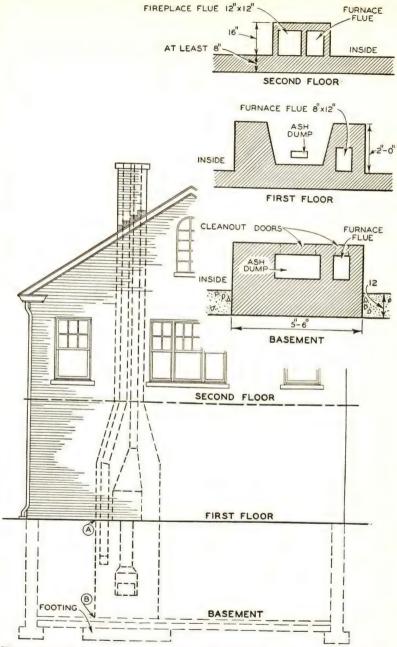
Fireplace Chimney as Part of Wall with Projection on Inside of Residence
